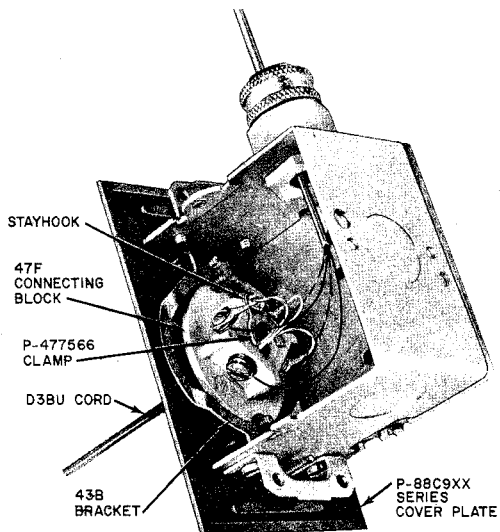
47-Type Connecting Box Mounted in Standard Electrical Outlet Box (Rear View)
